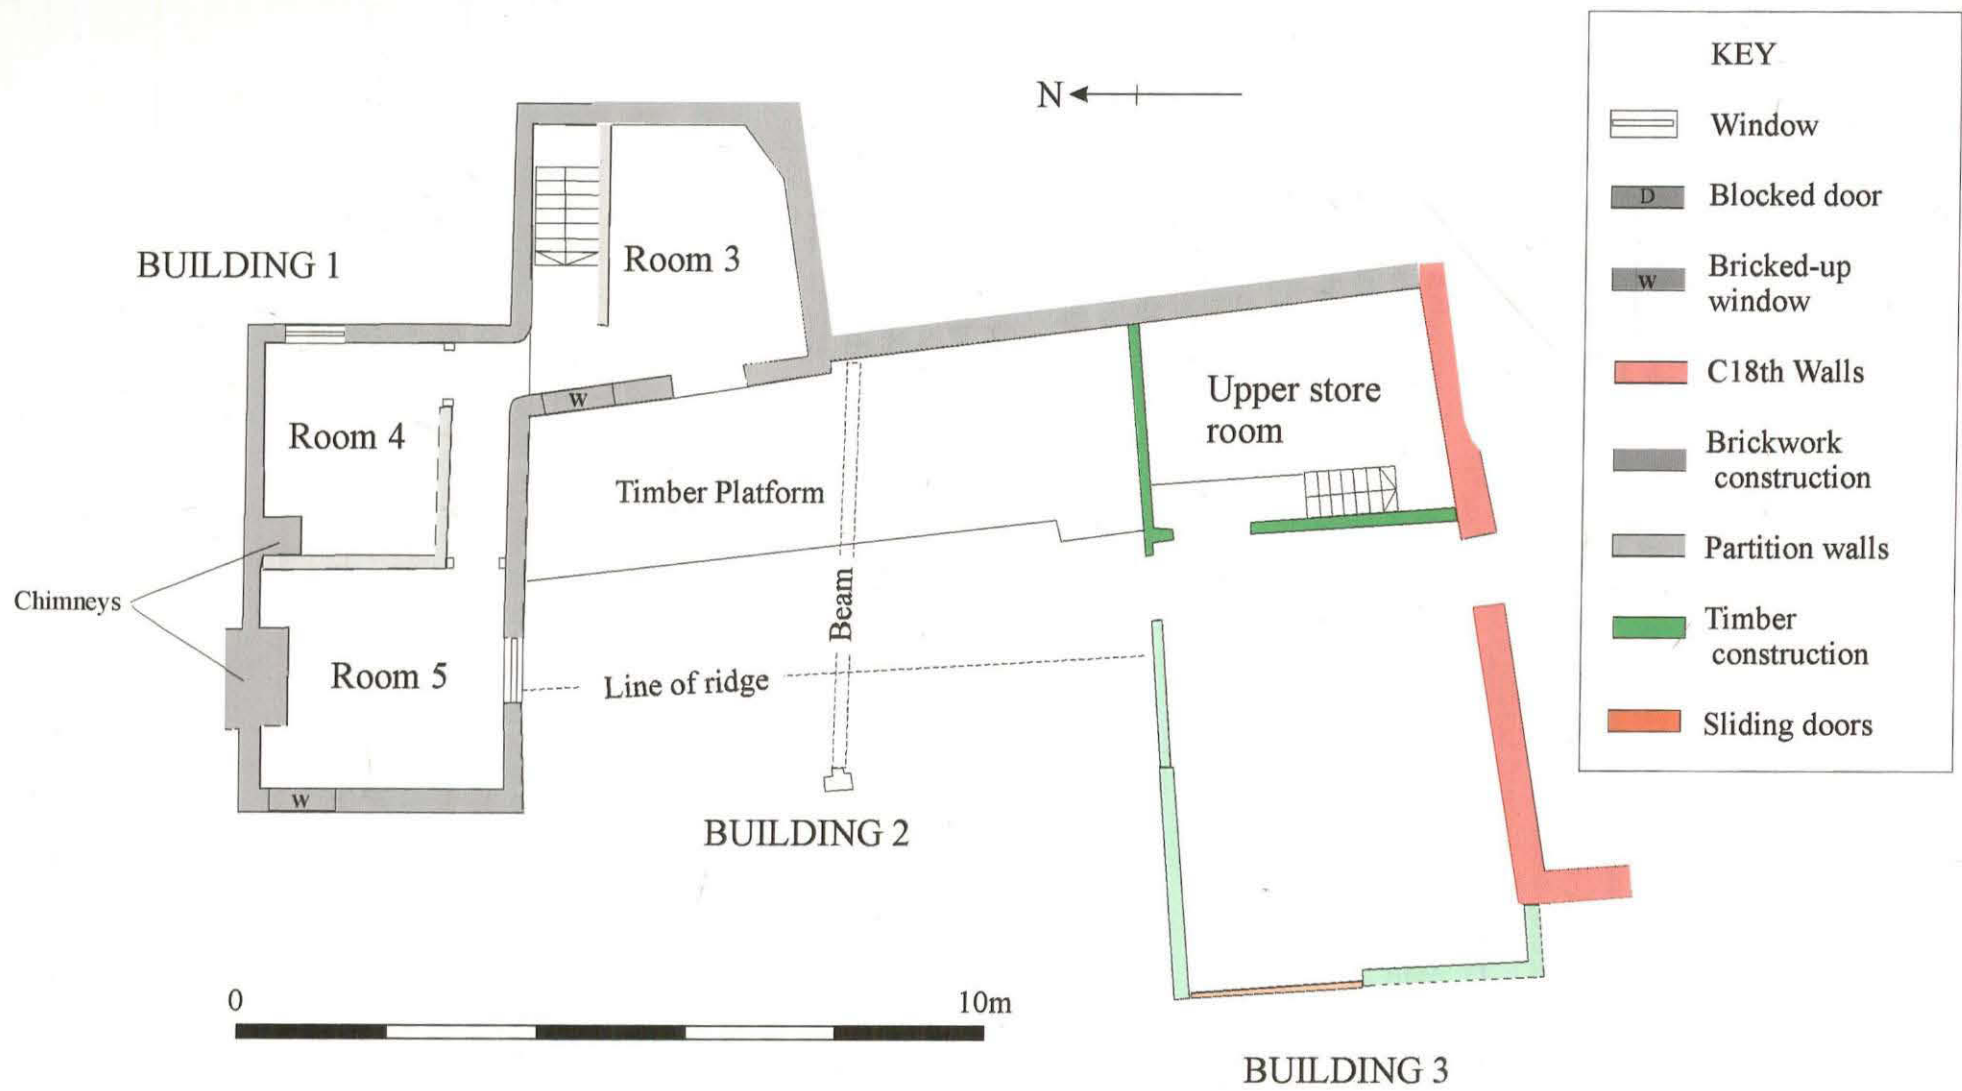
Plan of the first floor level of Buildings 1-3. Scale 1:100
